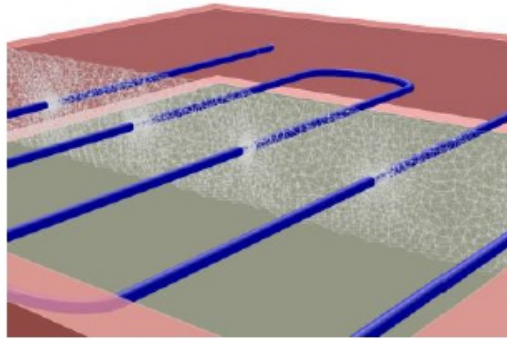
schematic diagram of the concrete wall plate embedded with S-shaped groundwater cooling pipe system
